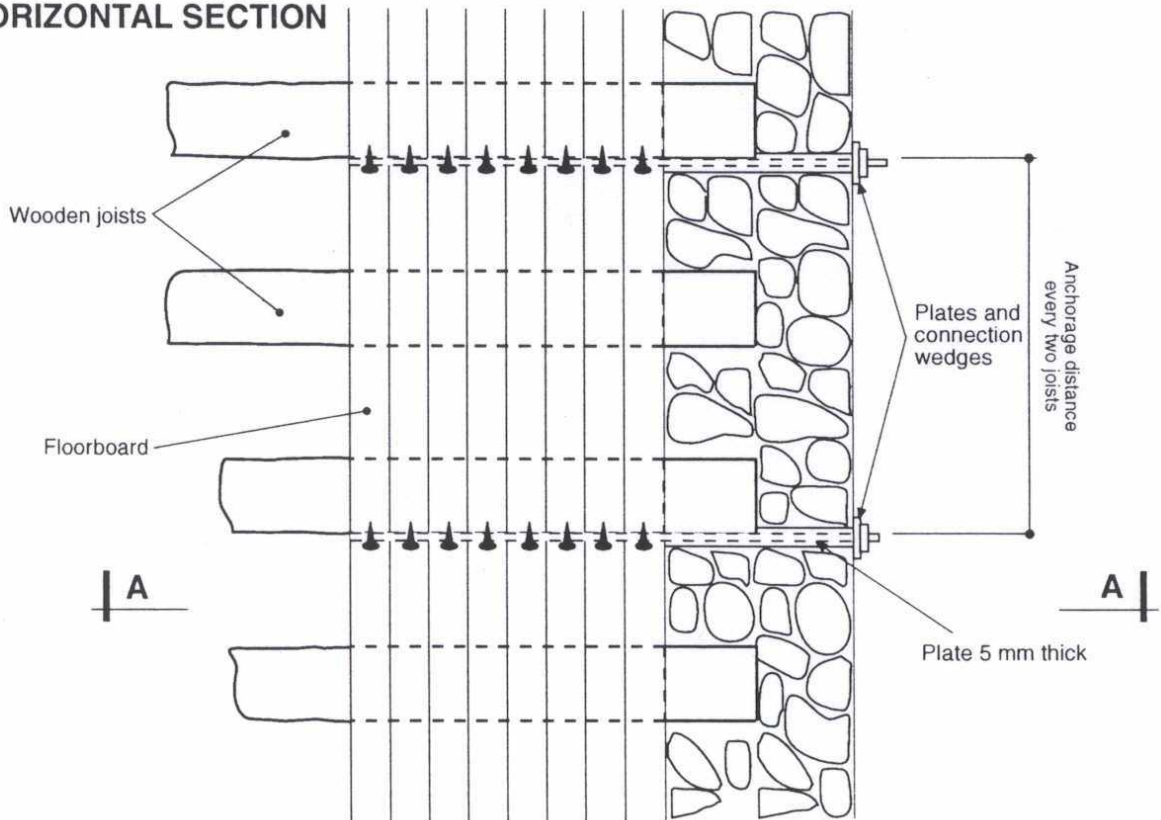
C: Seismic Strengthening - Steel Strap Used to Connect an Existing Masonry Wall to Timber Floor Joists
